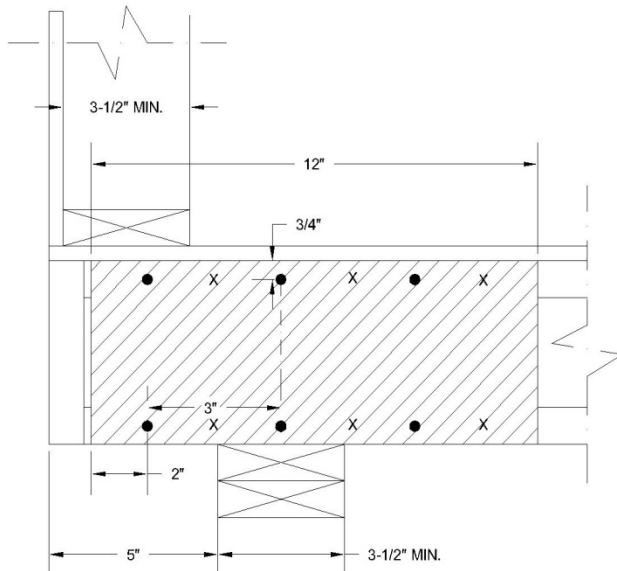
/32" APA Rated OSB – Full Depth Reinforcing (one side)
